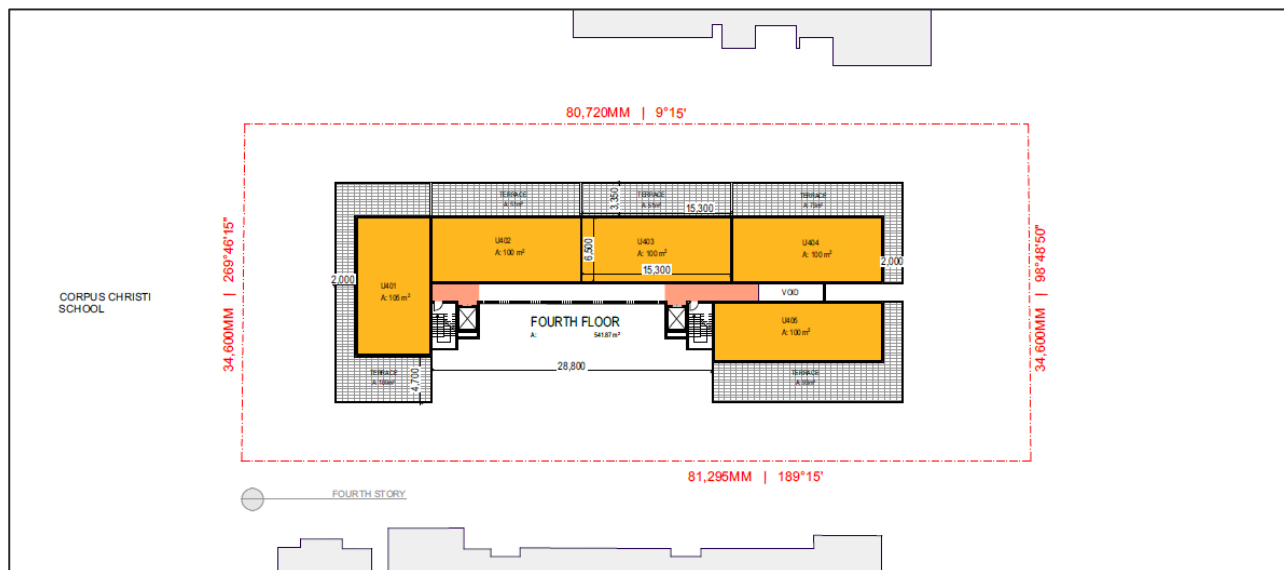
Proposed fourth floor plan (Source: mackenzie architects concept architectural plans)
